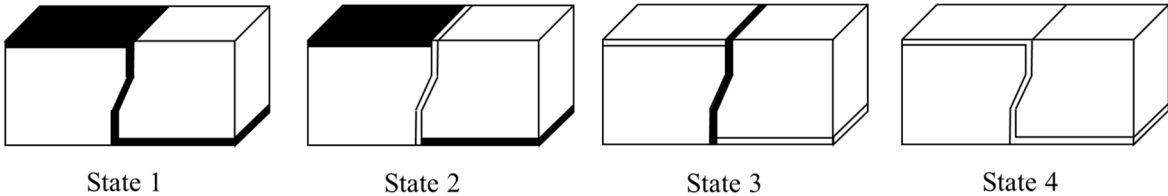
Joint states for the ceramic cup masonry (failed/open joints are in white).
